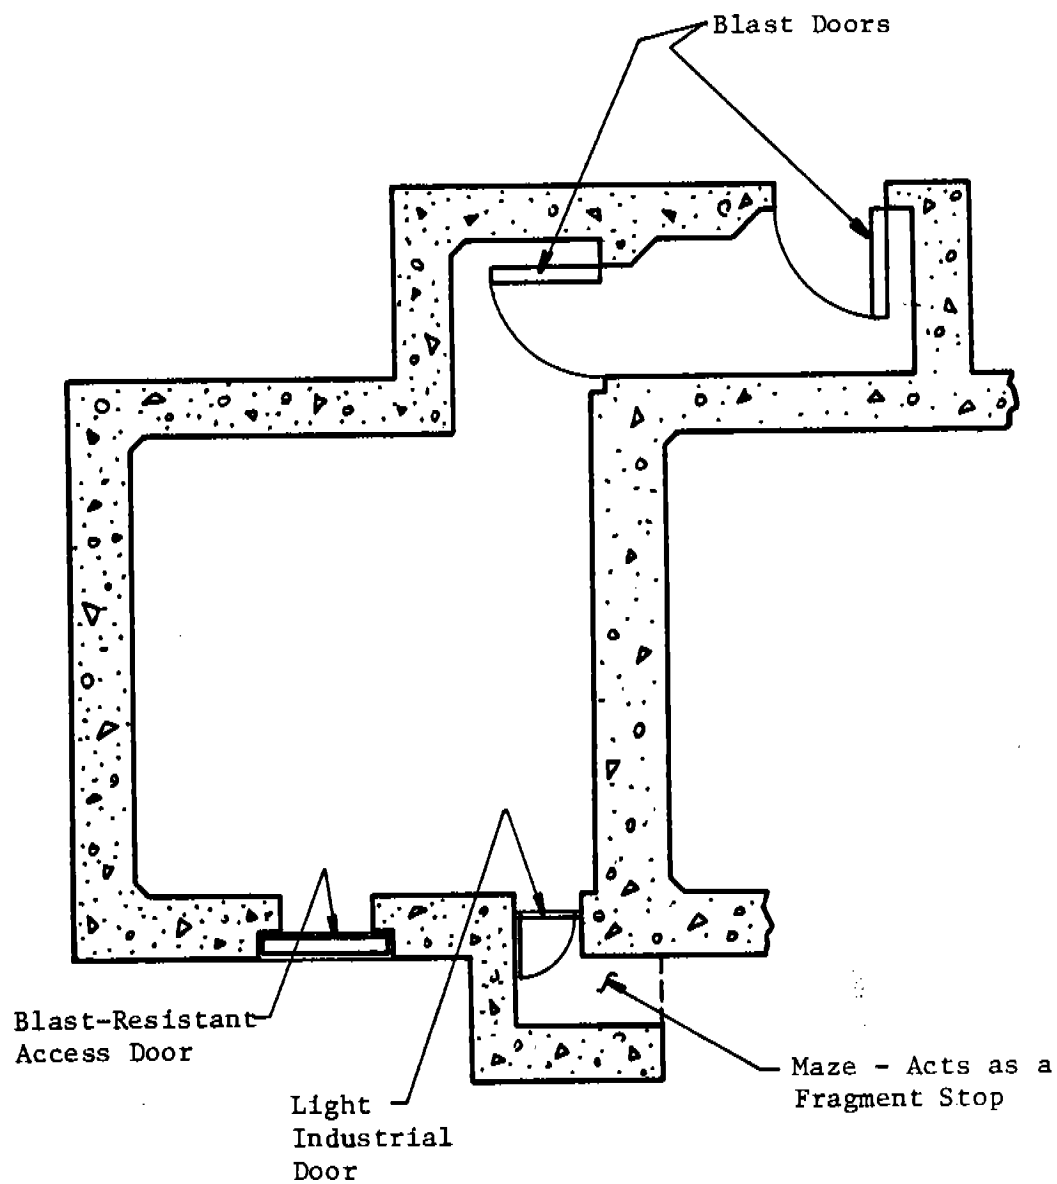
Plan View of New Design Containment Bay with Maze Venting
